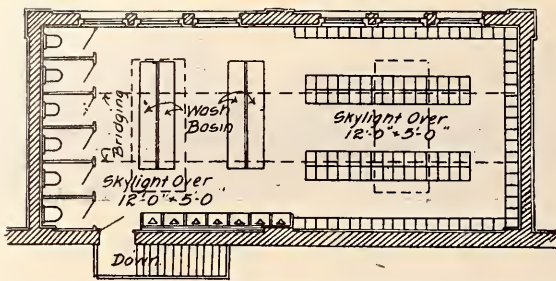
PLAN OF LAVATORY IN MACHINE SHOP—
